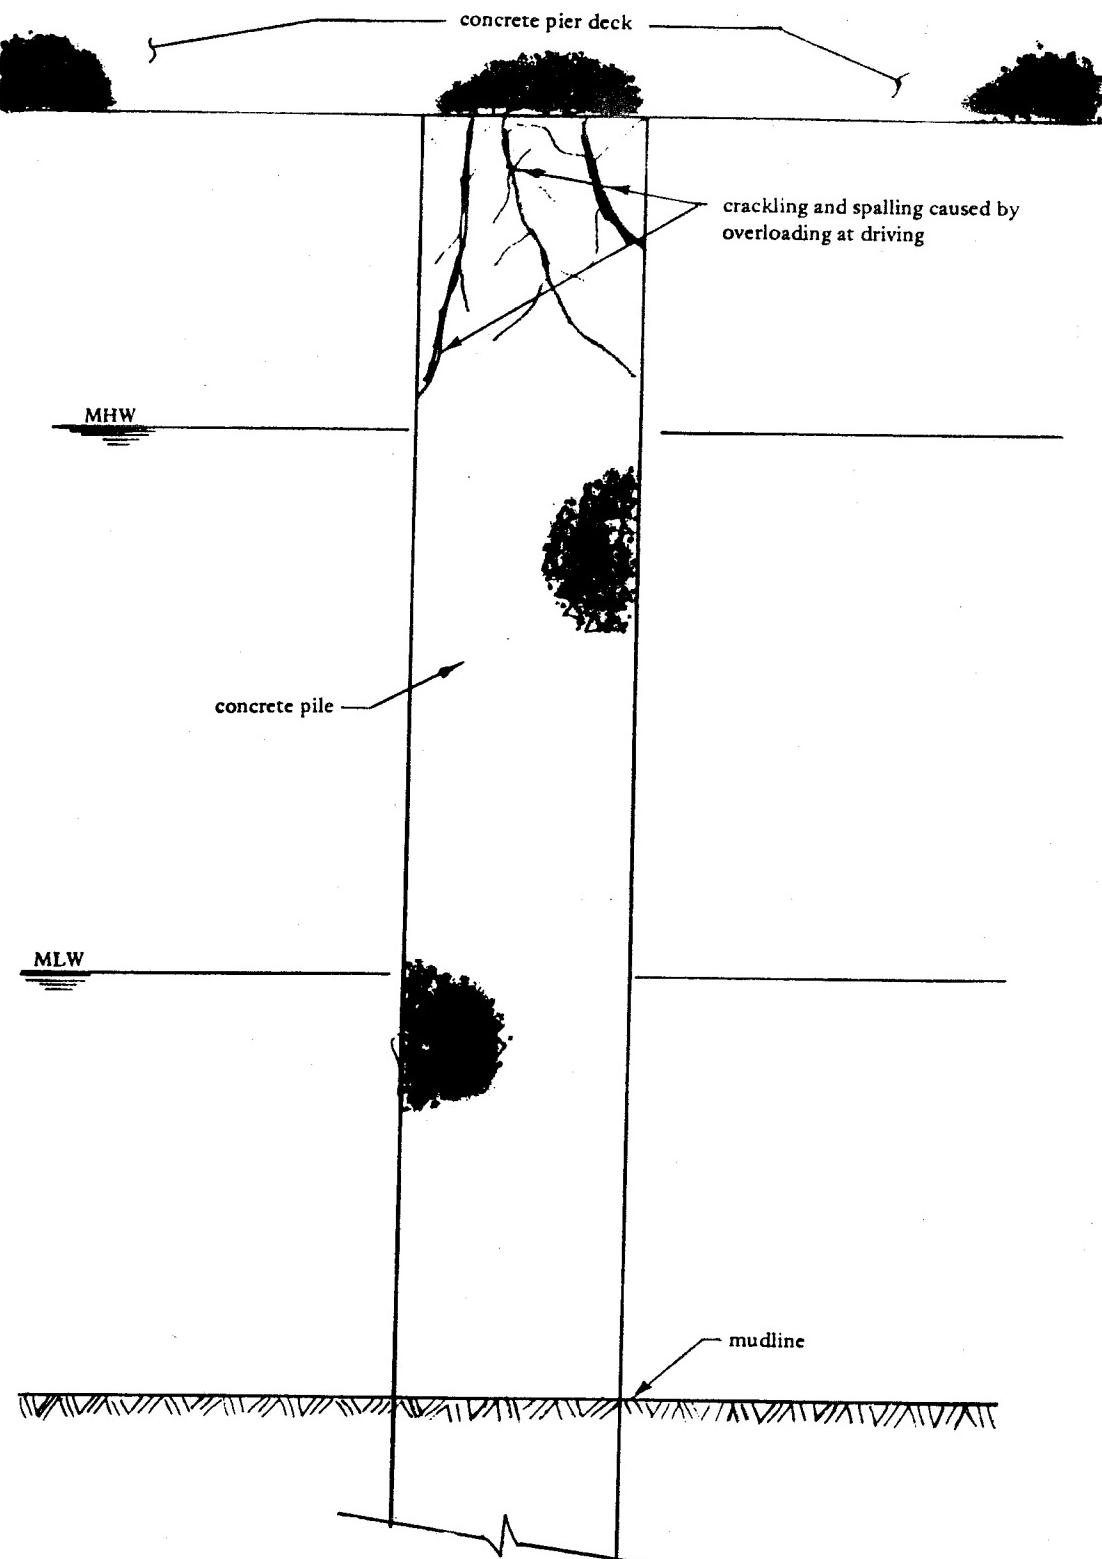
Mechanical deterioration of a concrete pile (from Brackett, Nordell, and Rail 1982)
